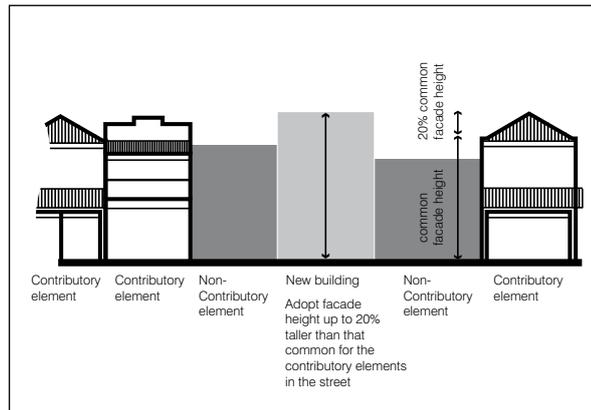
Facade height where a new building adjoins Non-contributory Elements in a higher density setting
